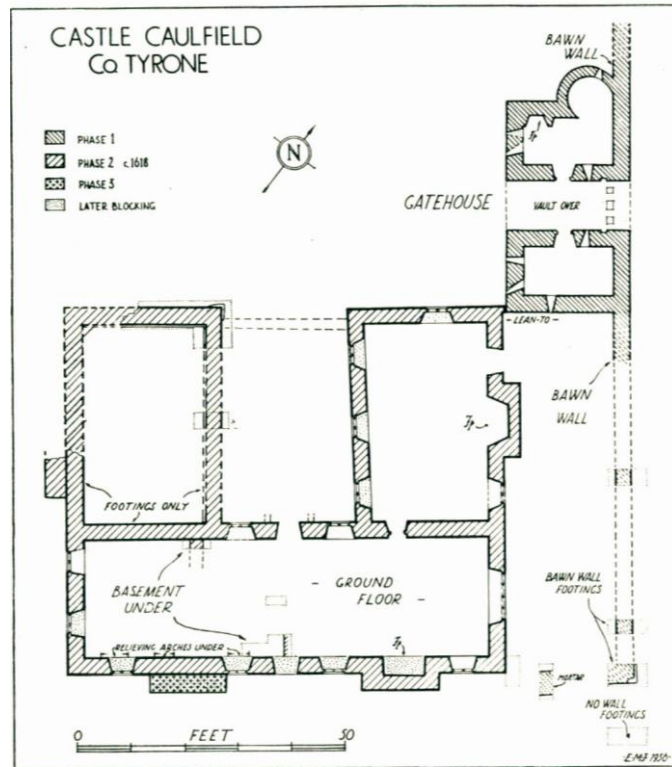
ground floor plan of castle with suggested features (after Jope 1958, Figure 1a)
